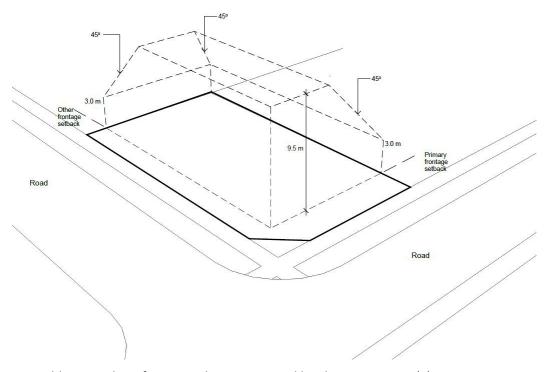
Building envelope for corner lots as required by clause 11.4.2 A3(a)
